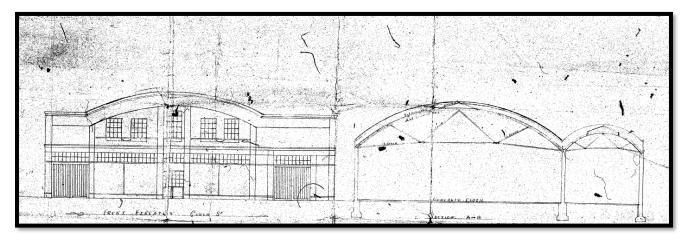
1925 street elevation and section, showing asymmetrical facade. (Source: HDC property file)
